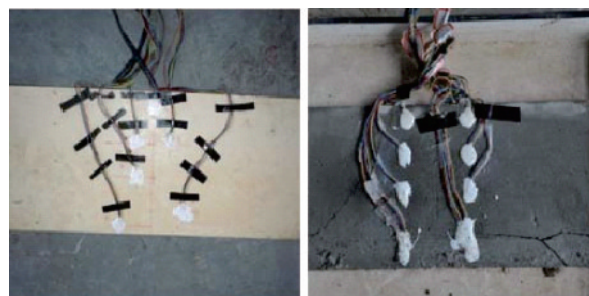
Upstream view of the polymer and concrete diaphragm walls
